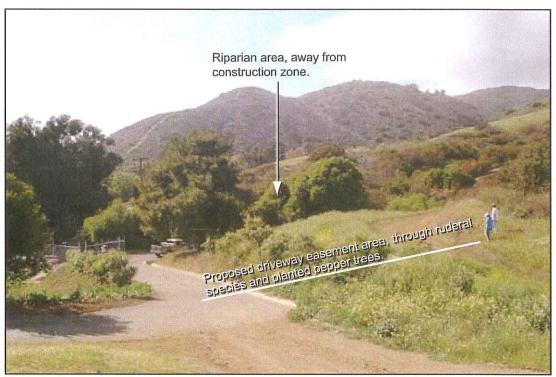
Southern portion of proposed driveway easement area looking southwest. Current landscaping and paved area visible.
